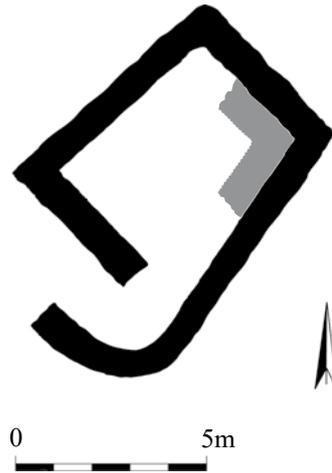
Redoubt; measured sketch plan (scale 1:200).
